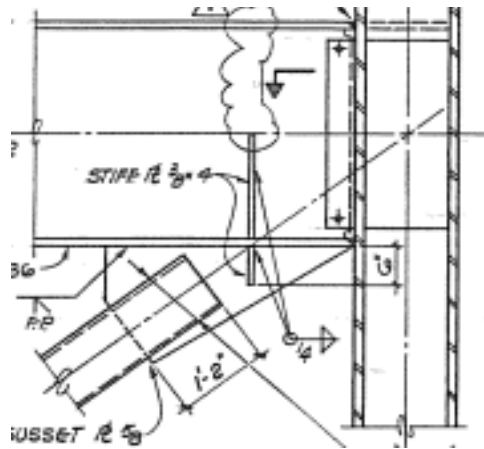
Top Connection Detail (80CA4A--2-AB-2)
